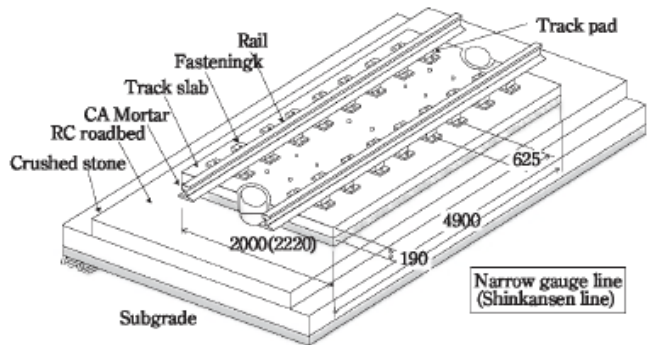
Slab Tracks with concrete slab on earthworks in Japan (UIC, 2002, Ando et al., 2001)
